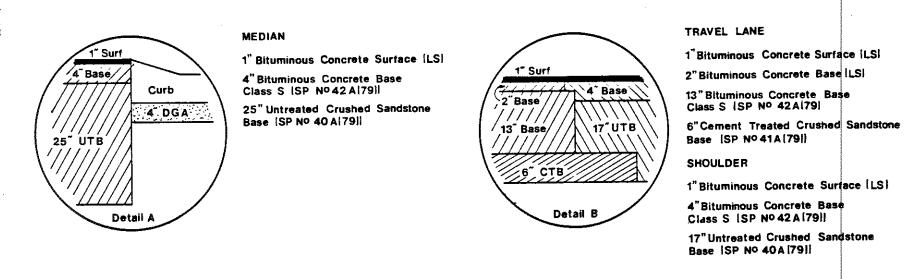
Typical Section and Detail for Main Line Section STA 1157+15 to STA 1542+90 (Section G).
